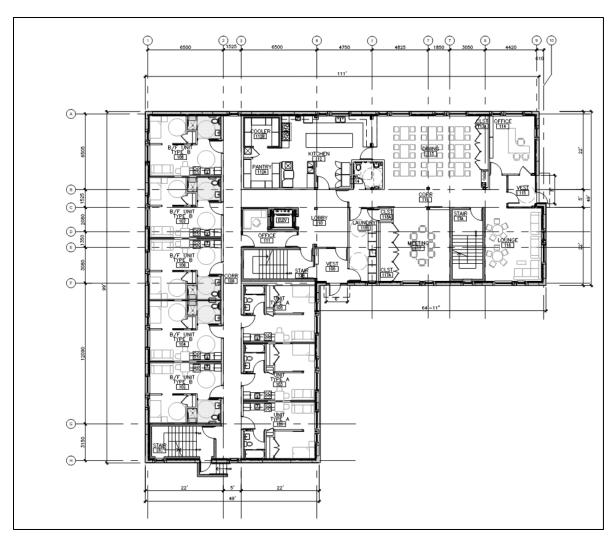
Example Floor Plan of Indwell's Blossom Park Apartments (Ground Floor)
